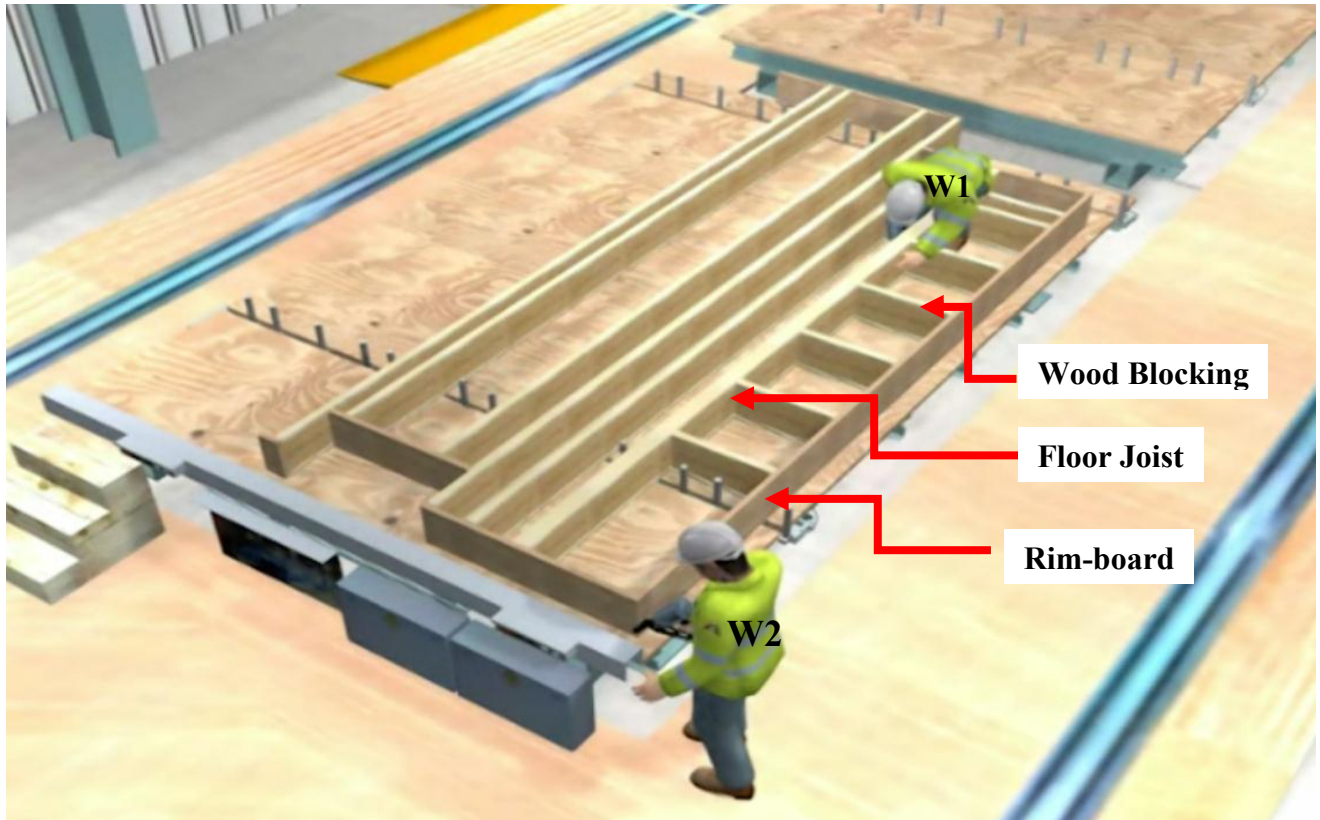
Floor framing (nailing of rim-board, joists, and blocking in awkward postures)
